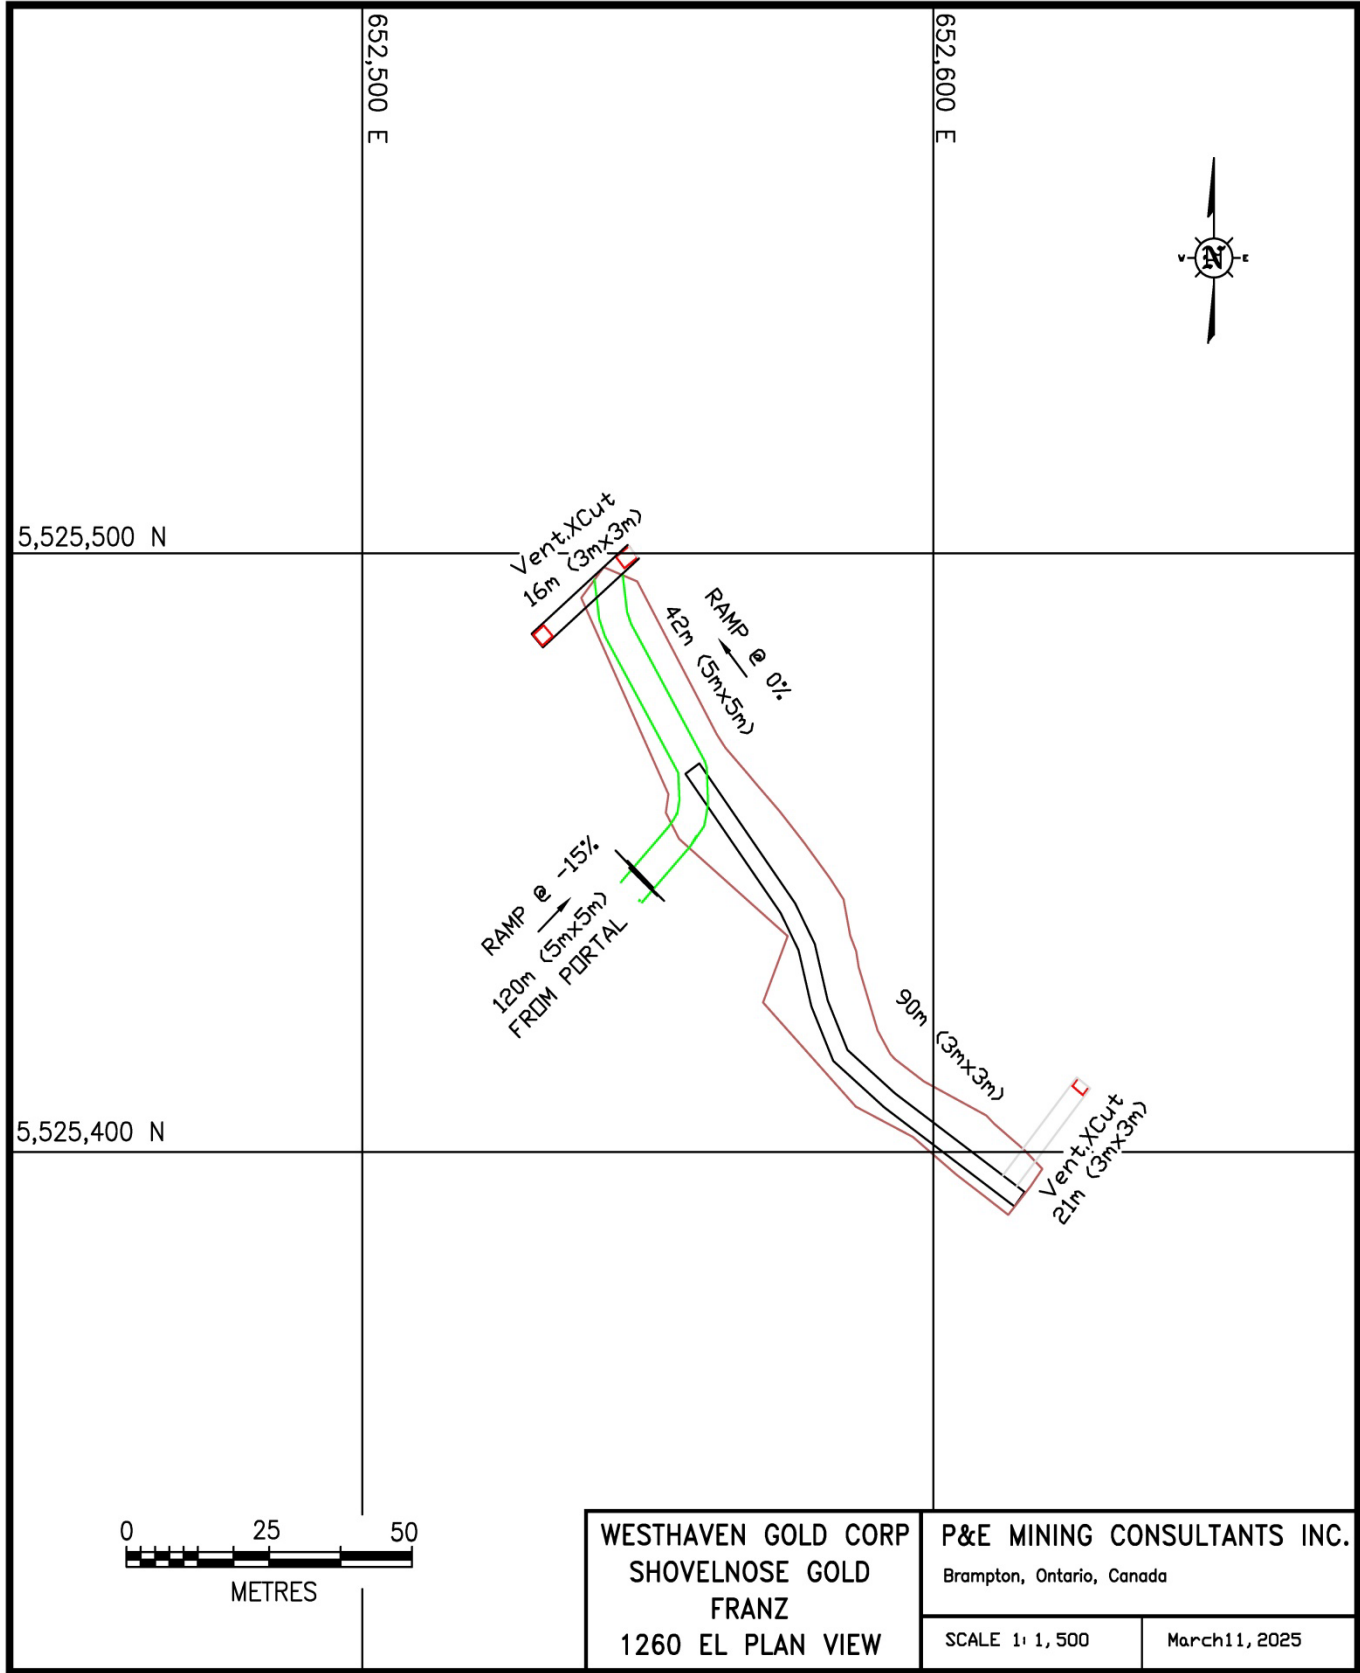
FRANZ ZONE 1265EL PLAN VIEW
